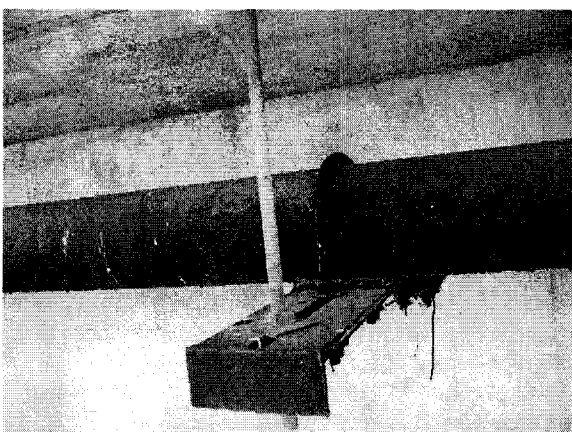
Washougal River Bridge Crossing: Close up view of as found condition of pipe supports.
